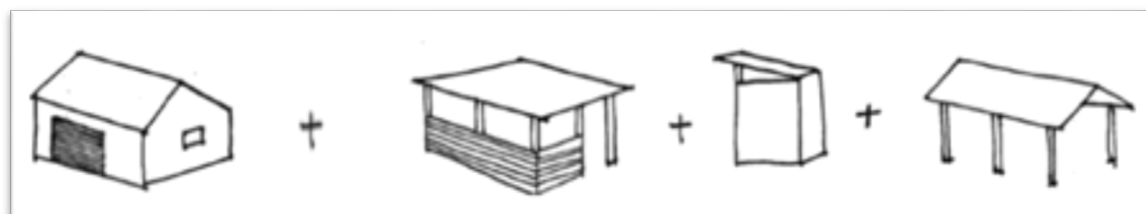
A habitable building, plus separate outbuildings including a shelter for food preparation, cleaning, a toilet and shower and covered living area are collectively classed as a dwelling.
